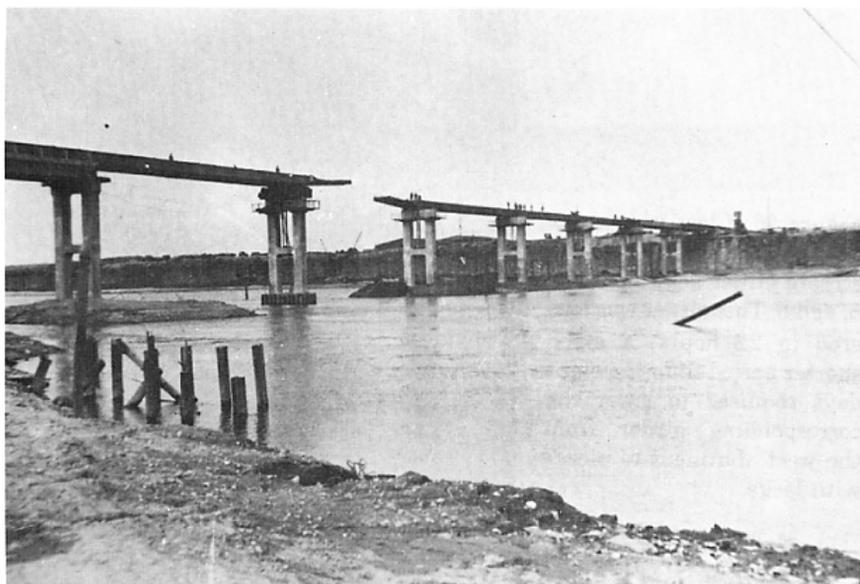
Launching the span across piers 7, 6, and 5. Launching noses extend both east and west into the gap between piers 5 and 6.
